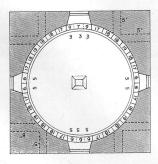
Floor Plan shewing numbers of Nest Holes in each column and openings.
